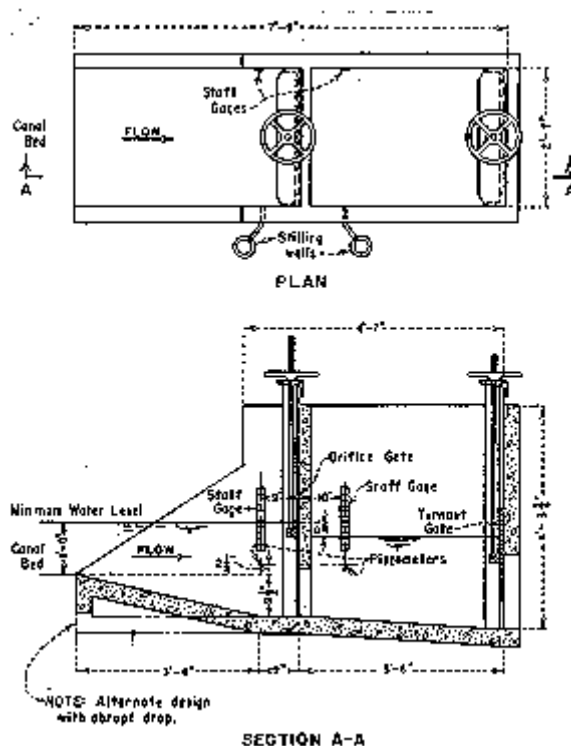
Schematic view of a CHO turnout with a sloping inlet channel and with piezometers and stilling wells.
